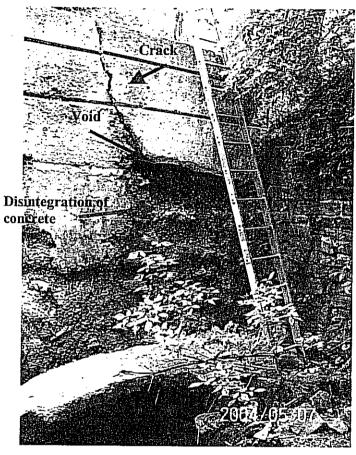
Vertical crack in south inlet wingwall and disintegration of concrete in lower portion of wall. Also note void behind upper portion of wingwall.
